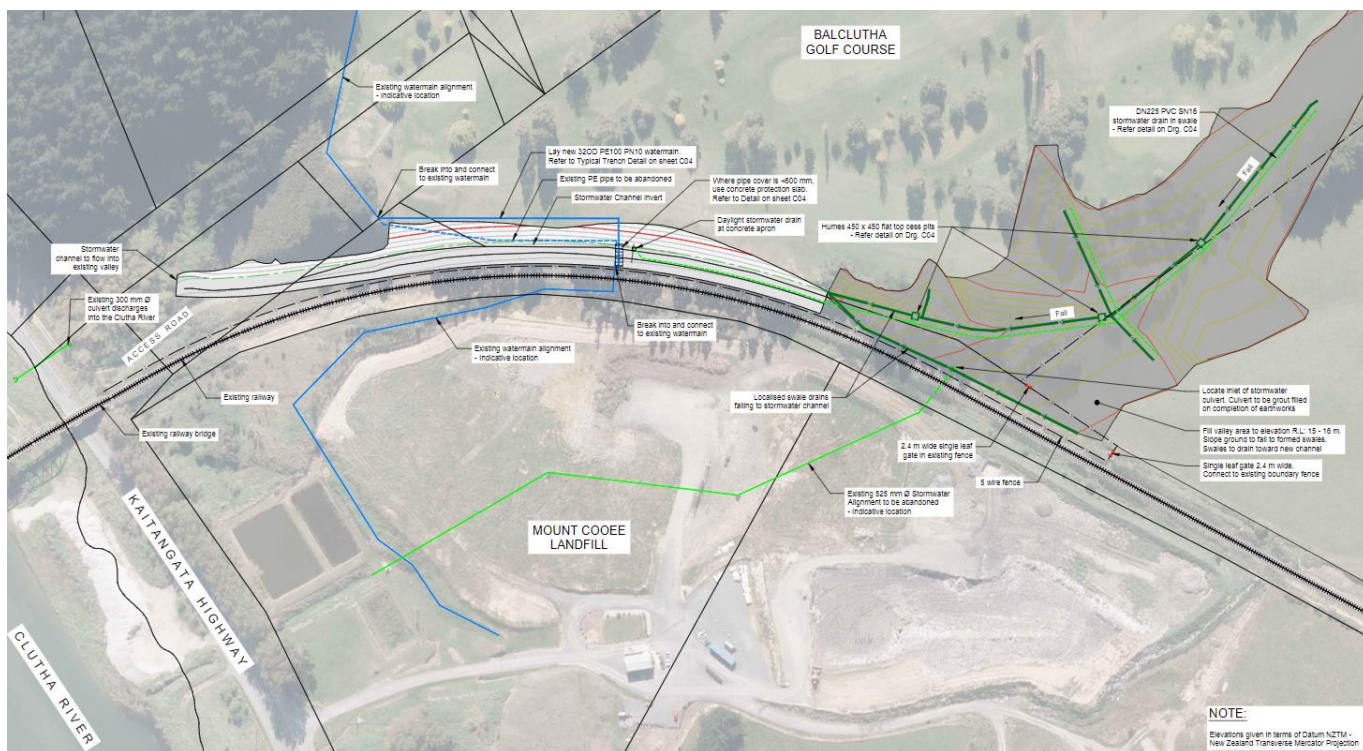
Site plan showing the existing stormwater drain (in green) and the location of the stormwater diversion (to the north of the landfill).
